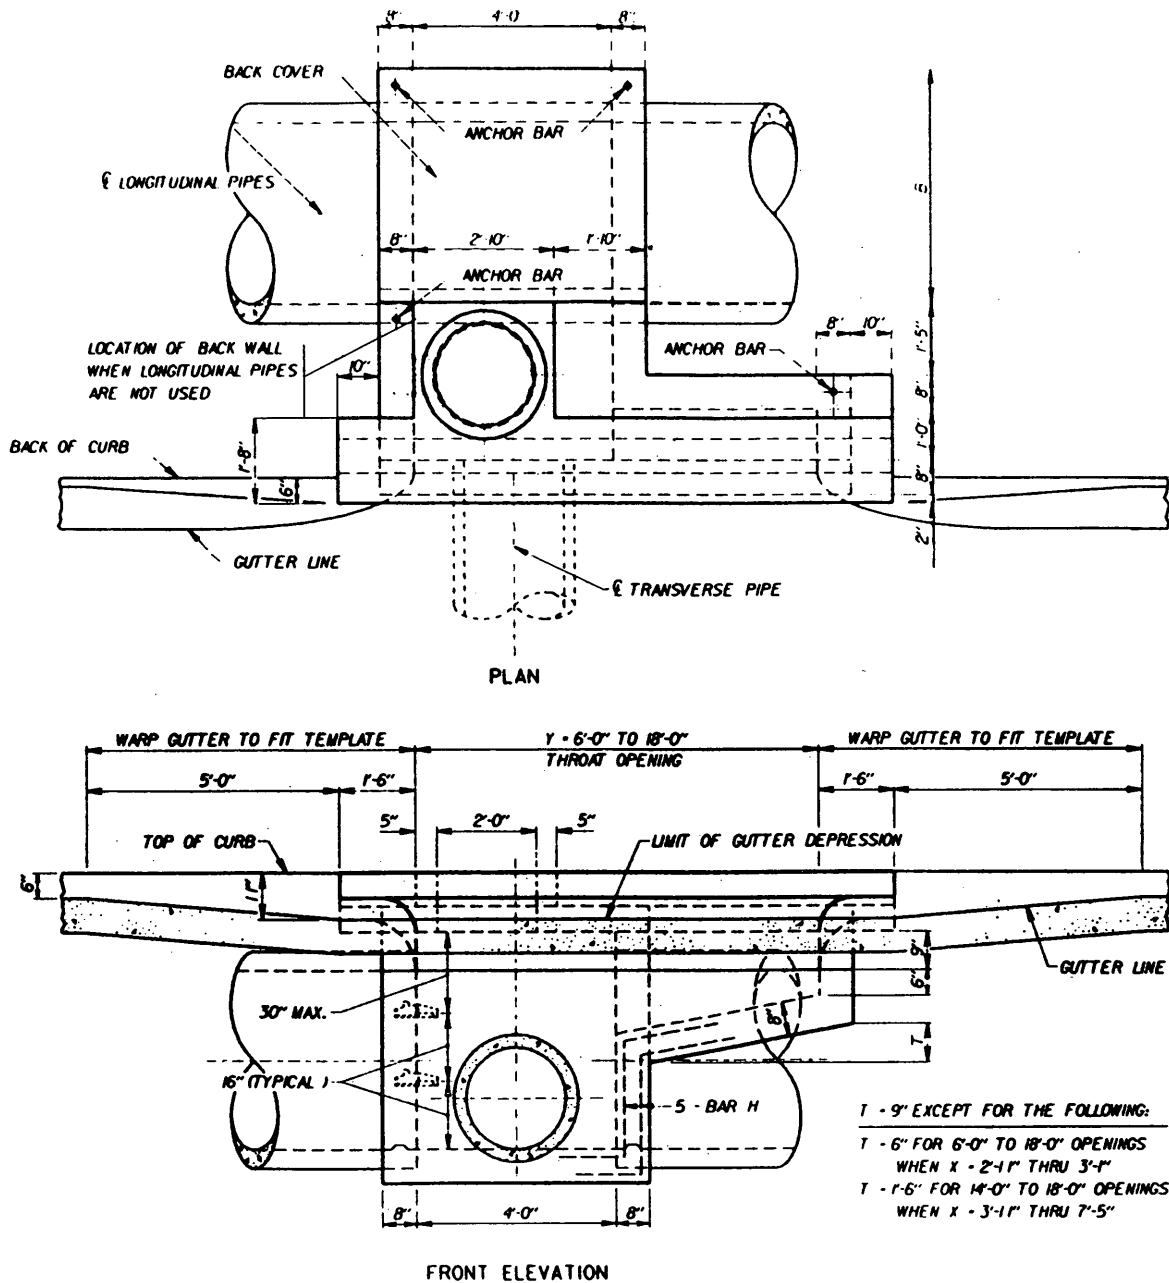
Plan and front elevation views of NDOR standard inlet with parabolic apron.
